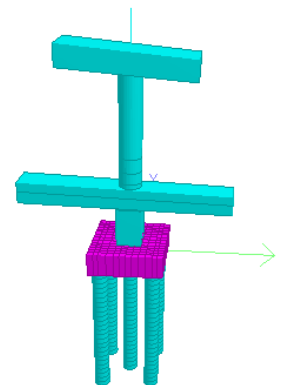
3D Elevation of Pier and Piles model in STAAD
